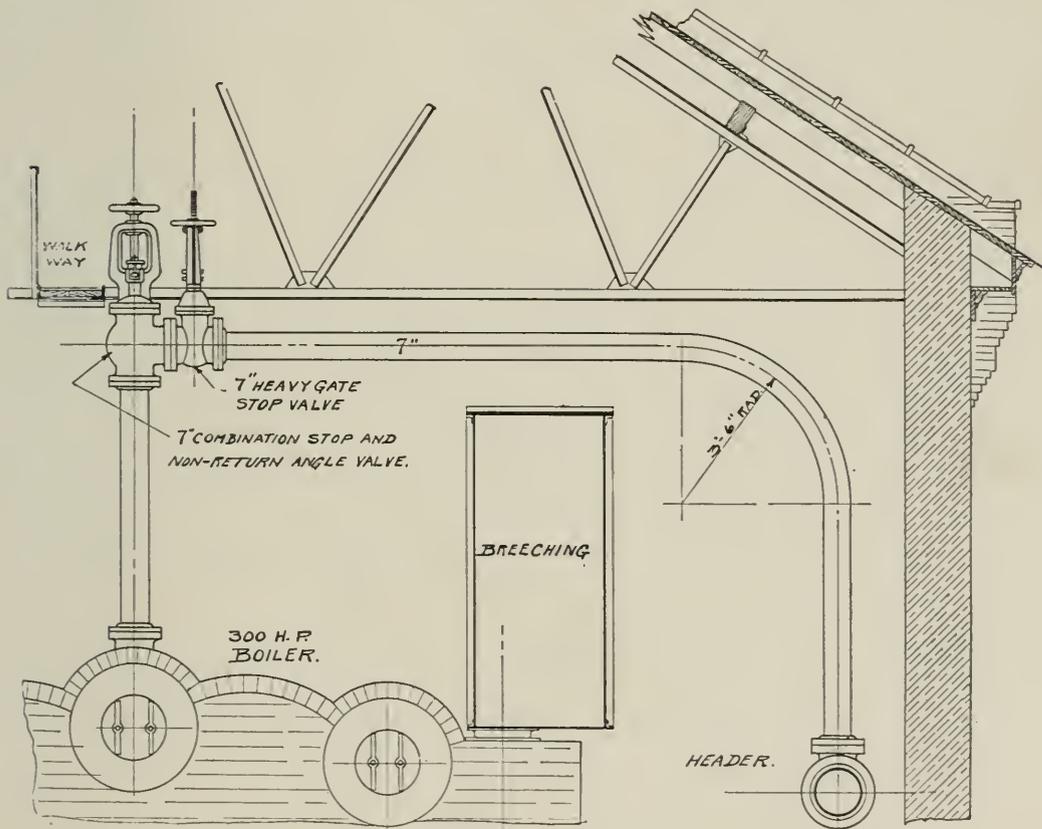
FIG. A. STOP-VALVE CONNECTION BETWEEN BOILER AND HEADER.
